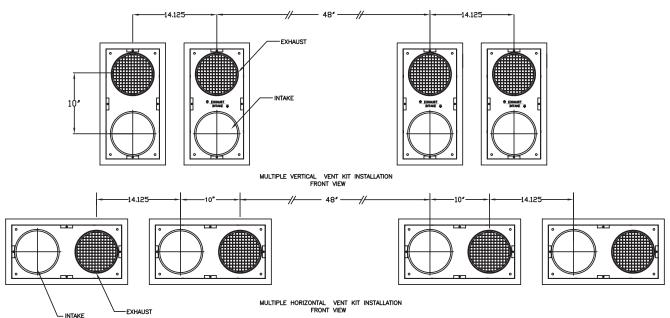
Multiple Stainless Steel Horizontal Vent Kit Installation – Front View
